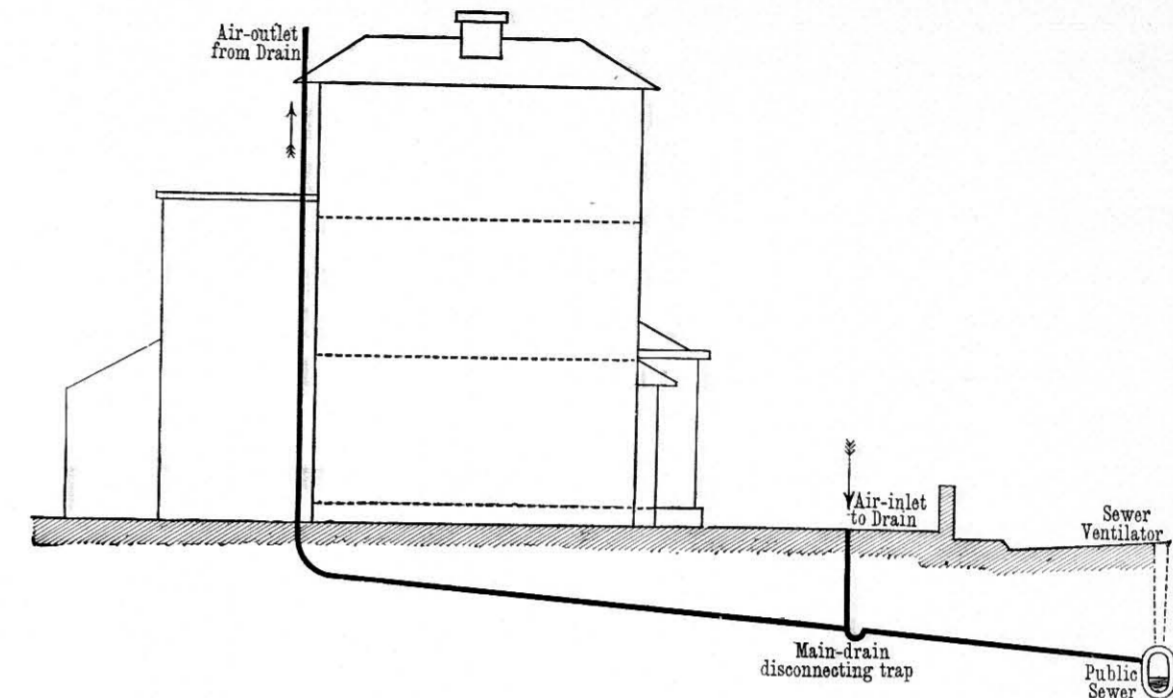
Section showing Drain-ventilation with Outlet at Head of Drain.
